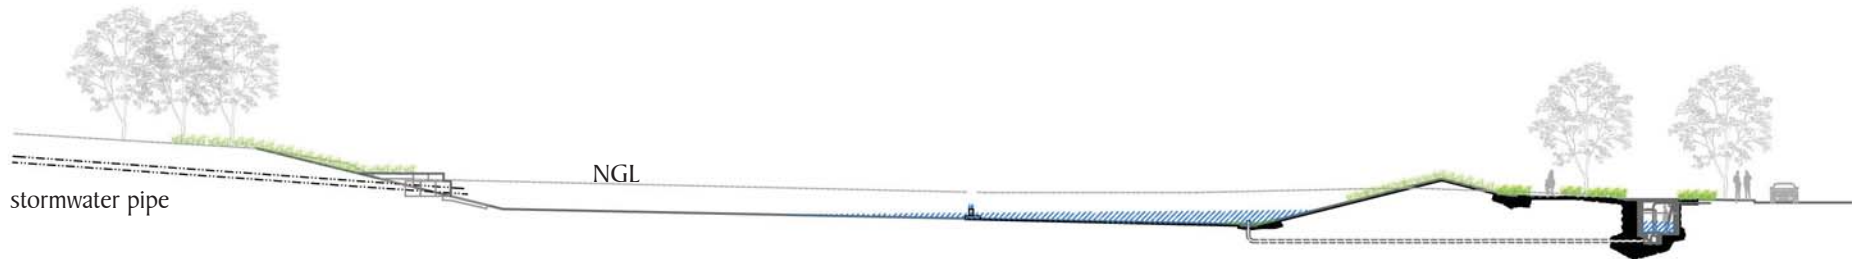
Typical north-south section through Dam I during winter. Scale 1:500 (Author, 2008)
